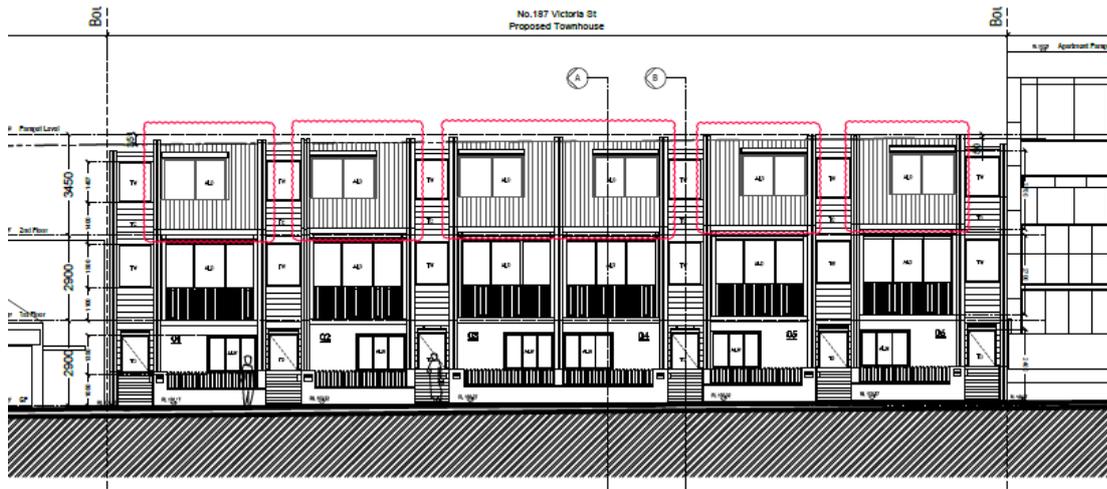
Victoria Street elevation of approved development at 187-189 Victoria Street
